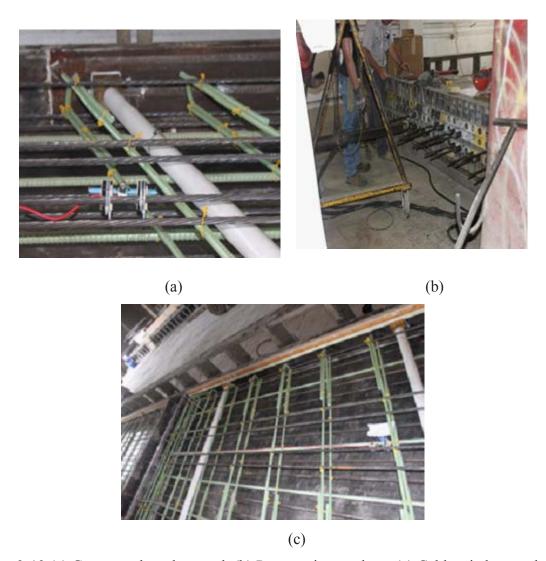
(a) Gauge anchored to steel, (b) Prestressing tendons, (c) Cables tied to steel rebar
